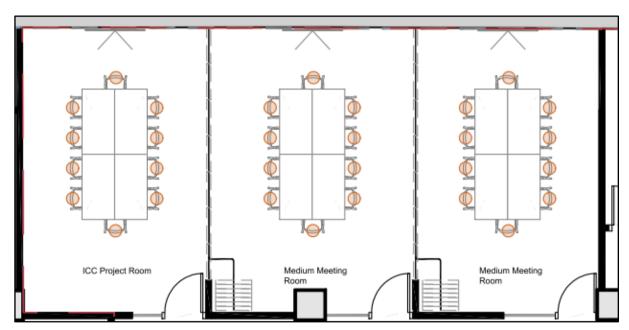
Level 2 folding wall meeting space as per P21 floor plan
